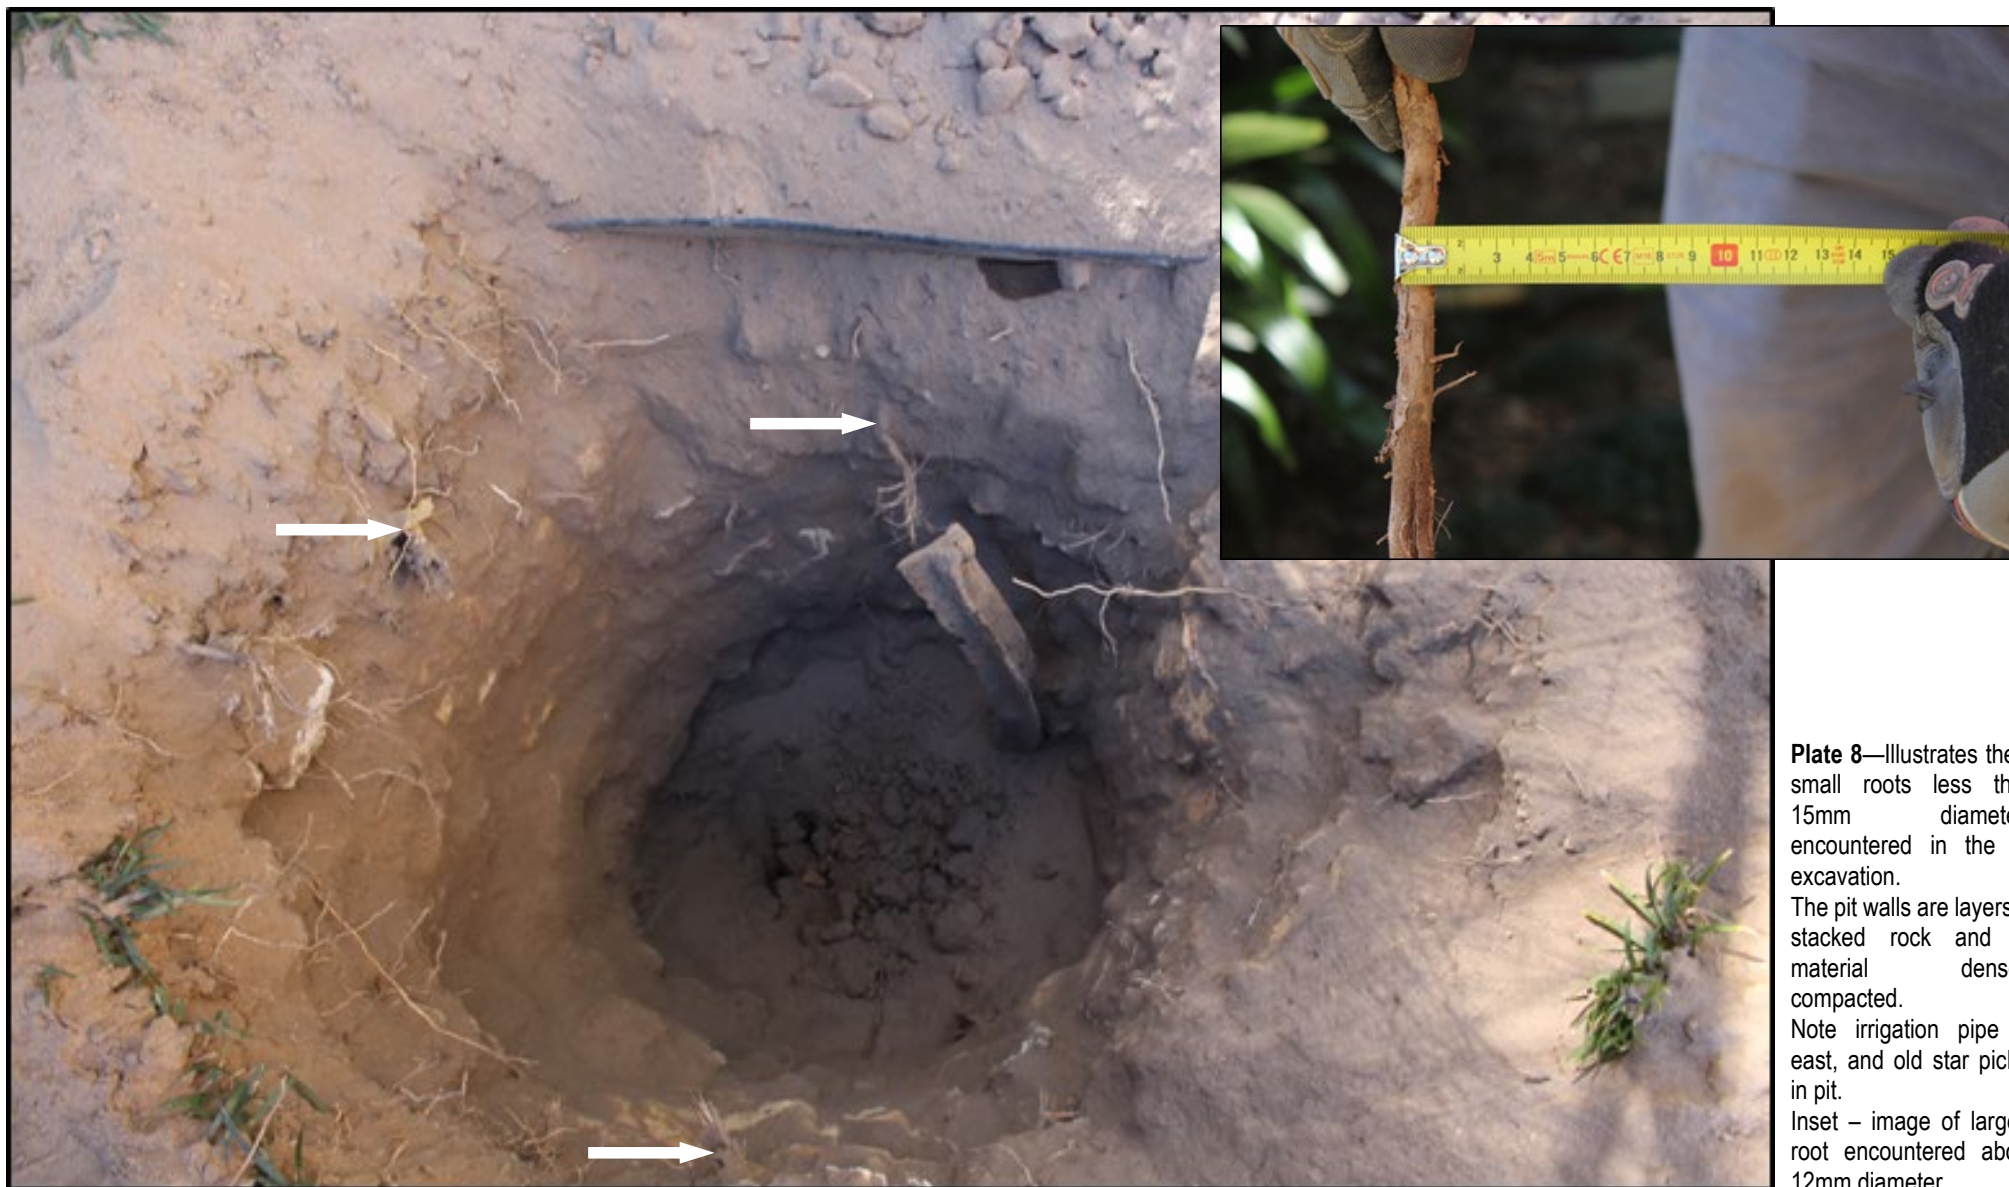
Illustrates the 3 small roots less than 15mm diameters encountered in the pit excavation.
